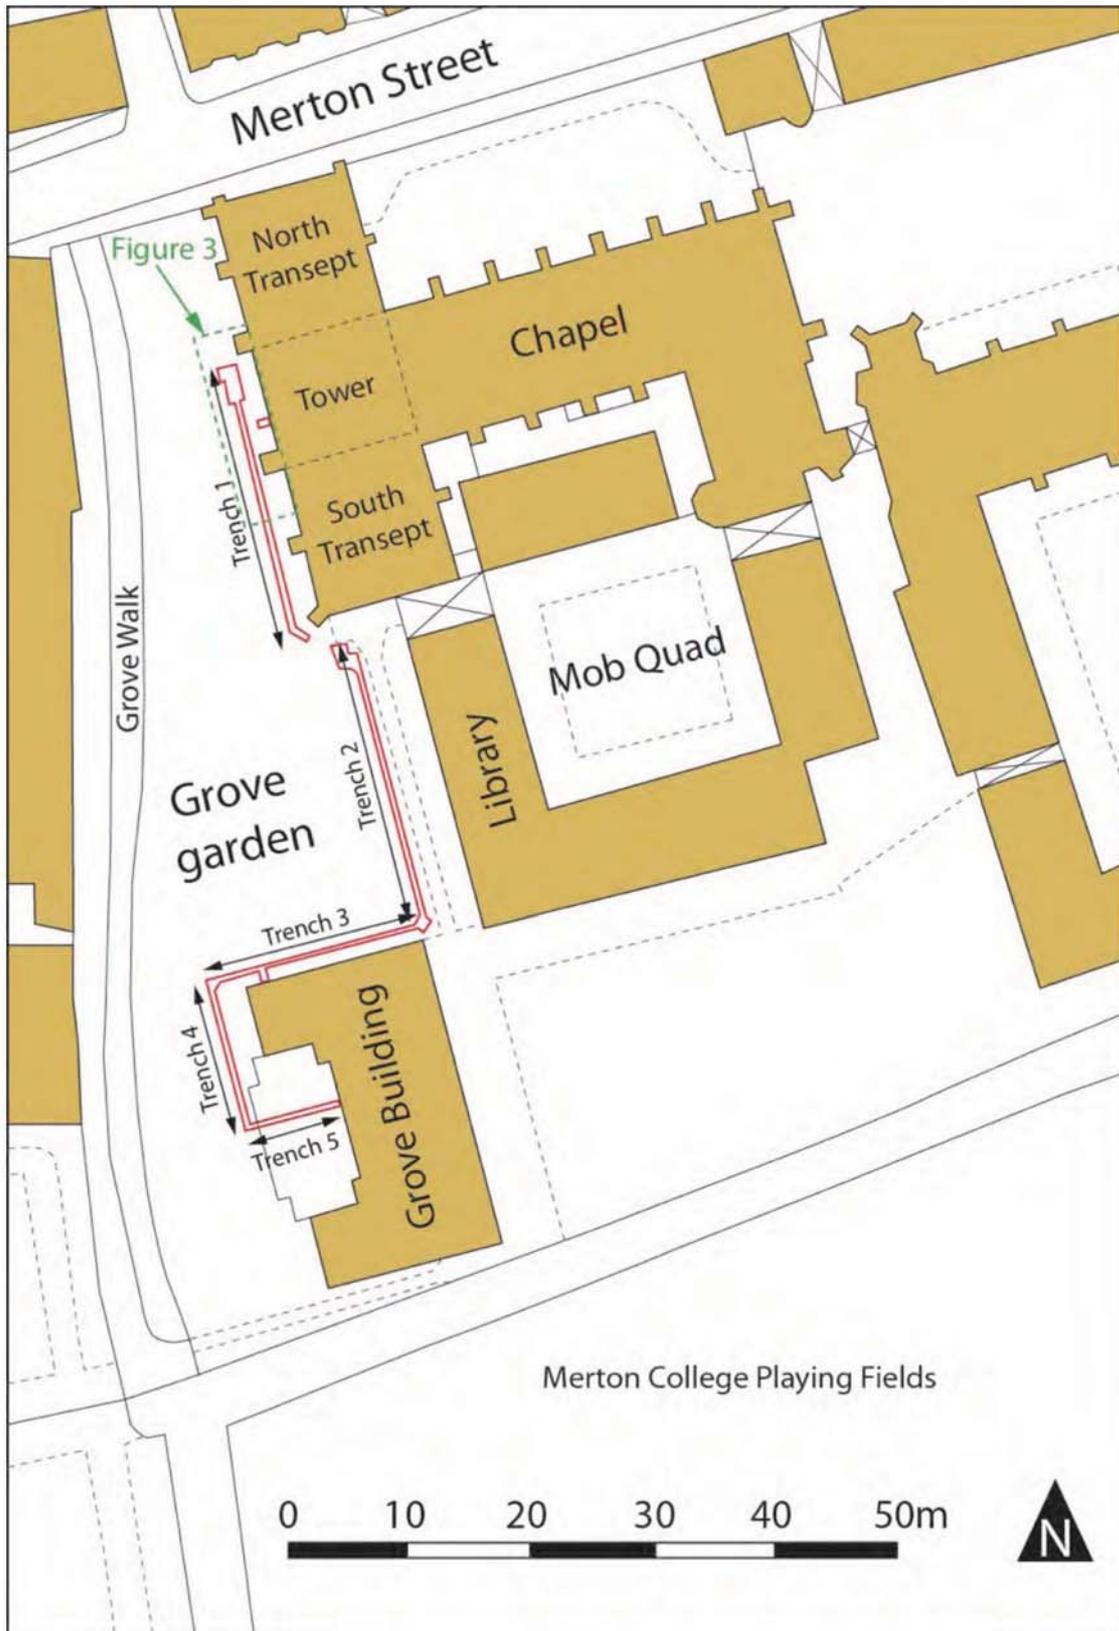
Location plan of Merton Grove Garden with route of electricity cable trench.
